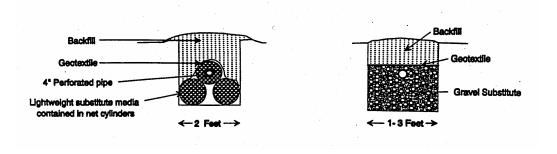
Typical Gravelless Chamber Drainfield, Cross-Section
